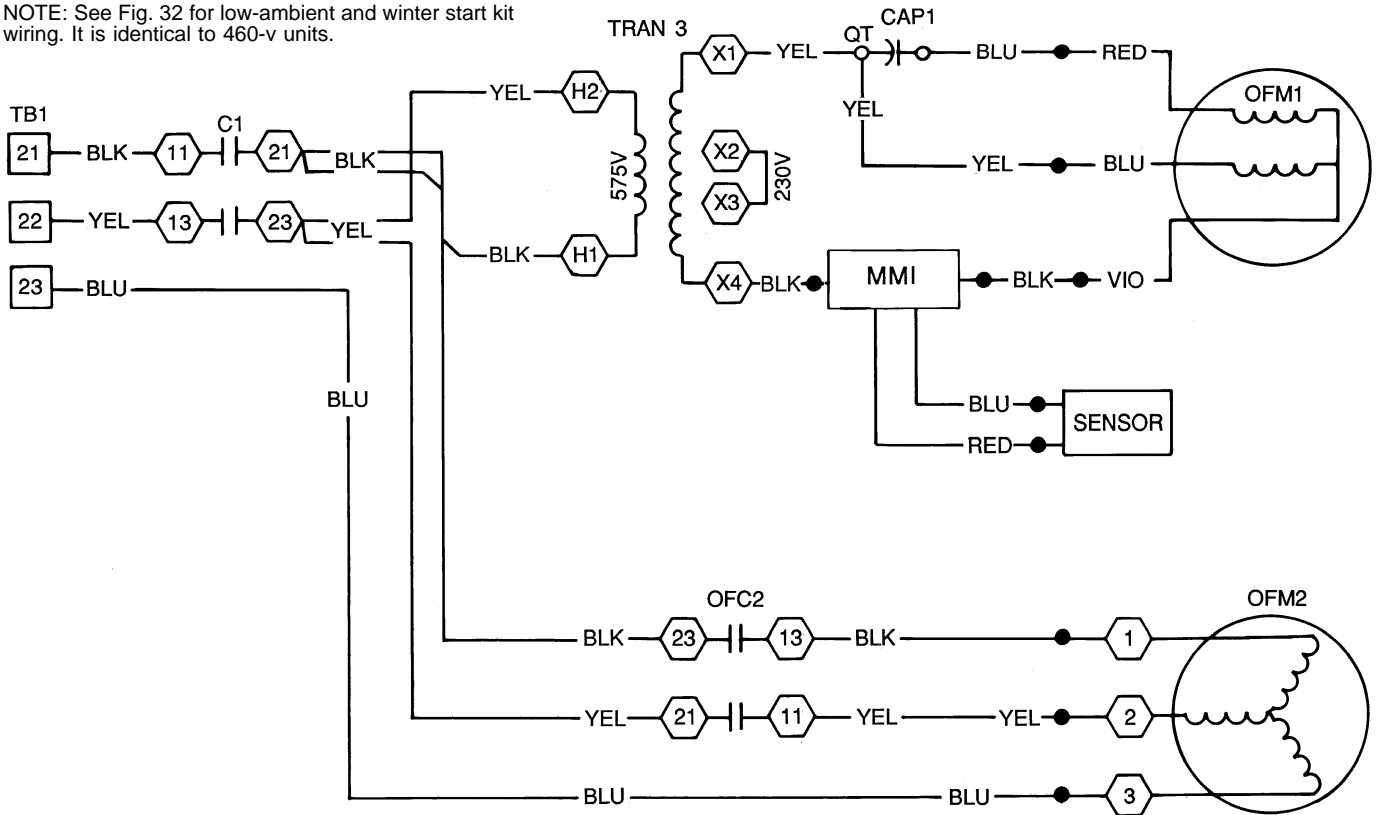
Wiring Details, Motormaster® I Controller Installed; 48/50HJ024, 575-V Units
